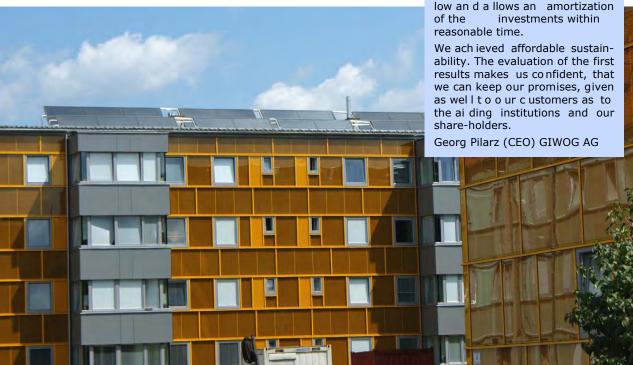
View on the finished façade – showing the new façade structure with integrated windows and balconies, and the solar thermal collectors on the flat roof
